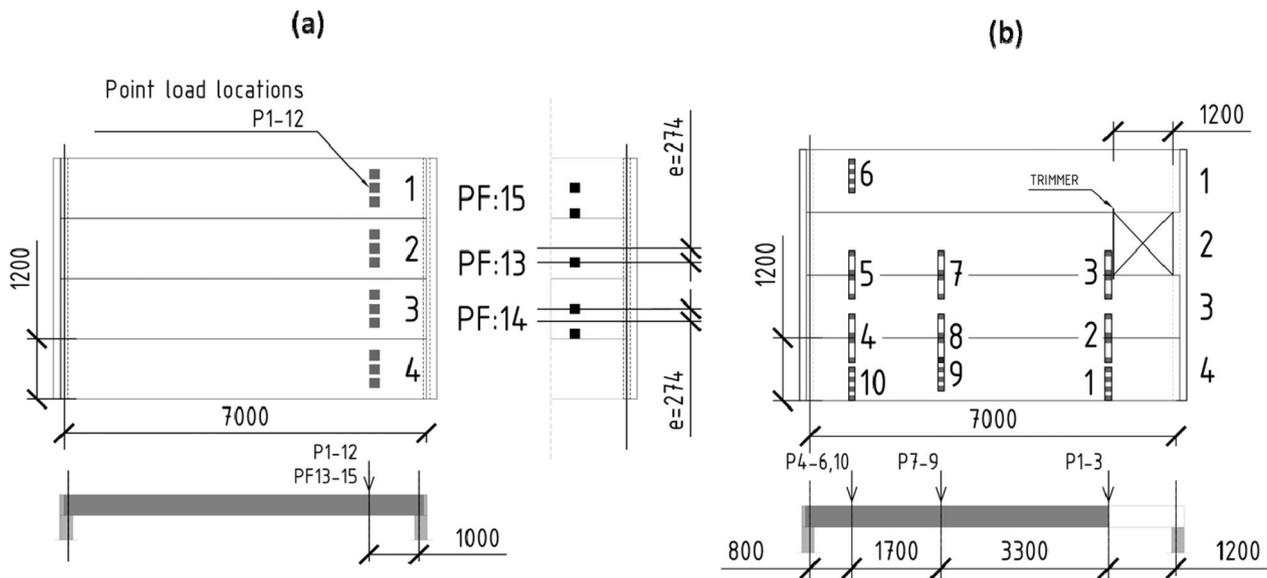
Load distribution tests<sup>33,34</sup> on (a) 400 mm floor, (b) 200 mm floor with opening. Source: Adapted with permission.<sup>33,34</sup>
